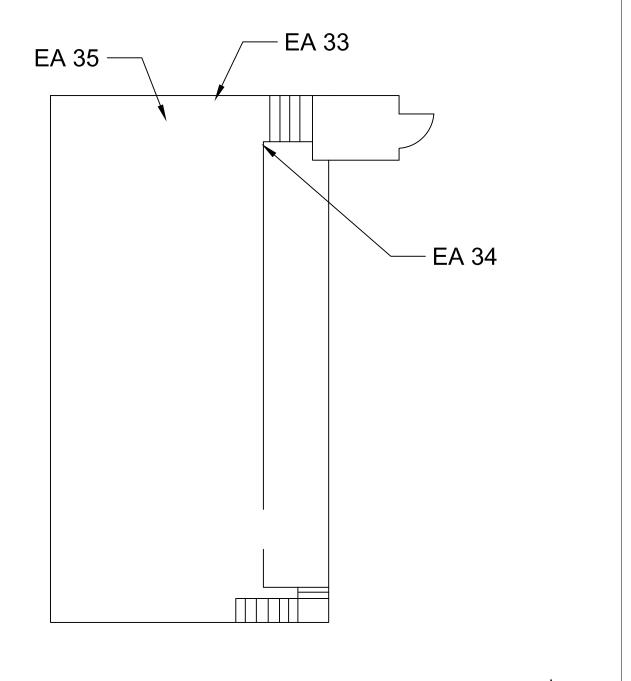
Sample Locations East House Basement 2019 14th Street Santa Monica, CA 90405
